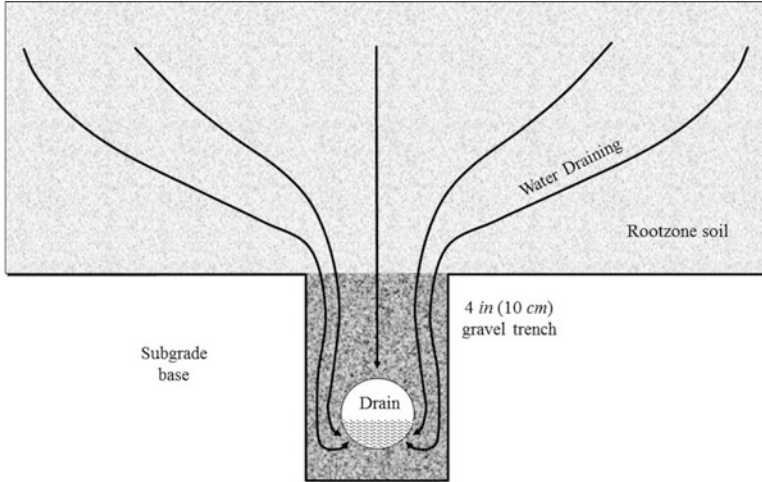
Water enters drain lines from the bottom of trenches, as this is the point of lowest water potential
